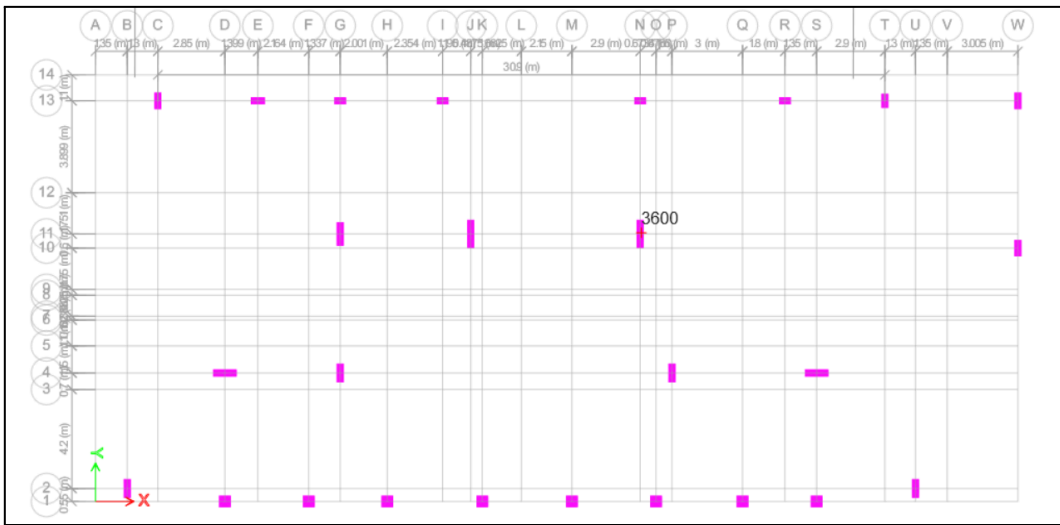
Total longitude bars (area) for column N11 ground floor
